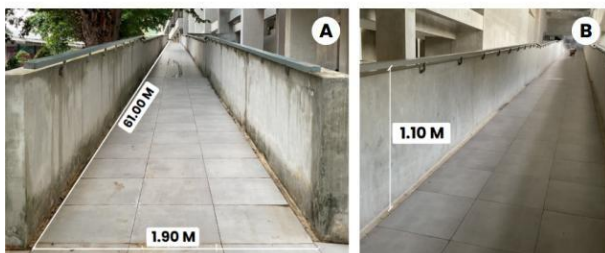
Outdoor Ramp to 2nd floor (Author 2025)
